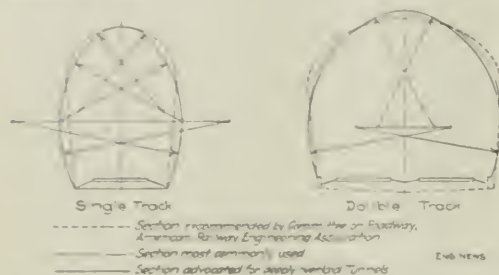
TUNNEL SECTIONS FOR SINGLE AND DOUBLE TRACK
